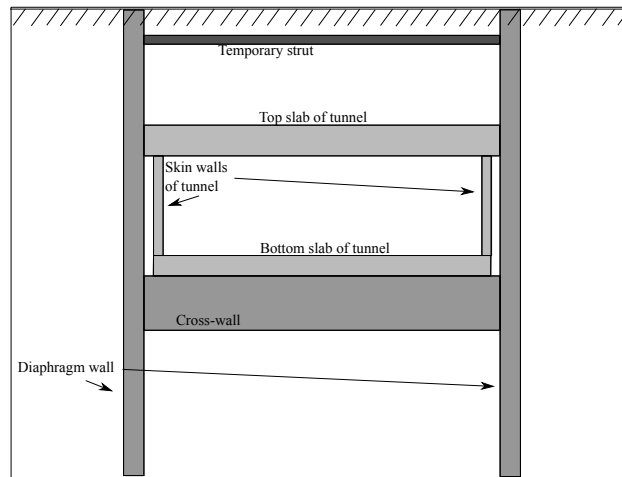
A tunnel connected to D-walls by the tunnel roof
